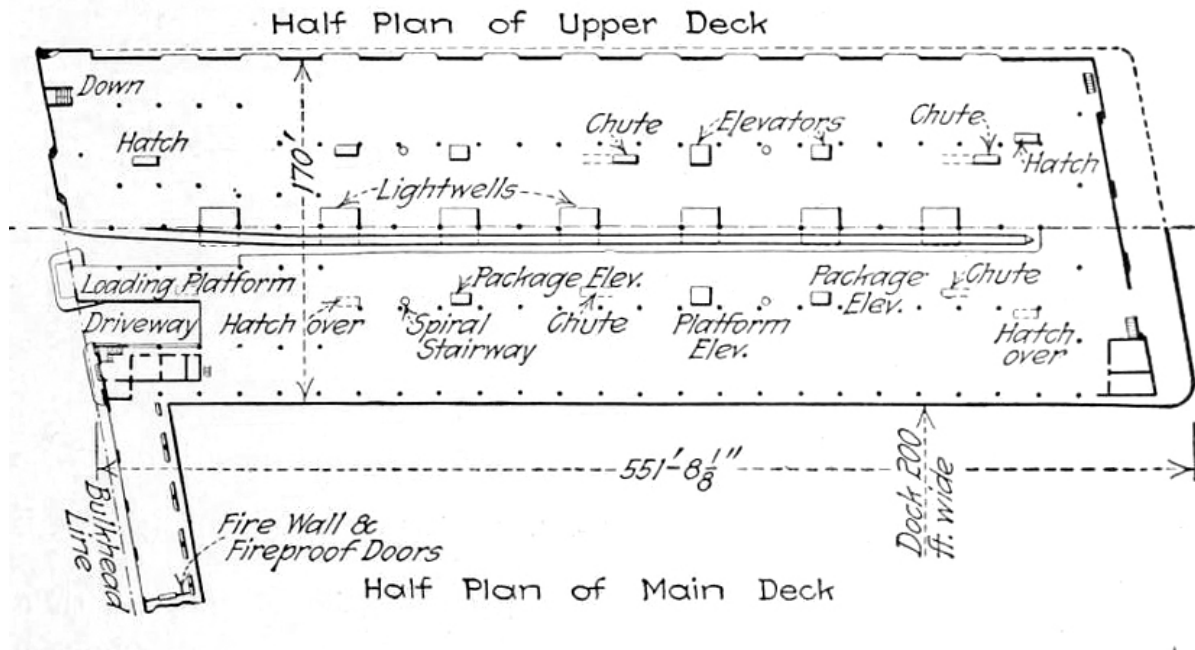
Half plans of Pier 38 (from *Engineering News*, August 26, 1915).
